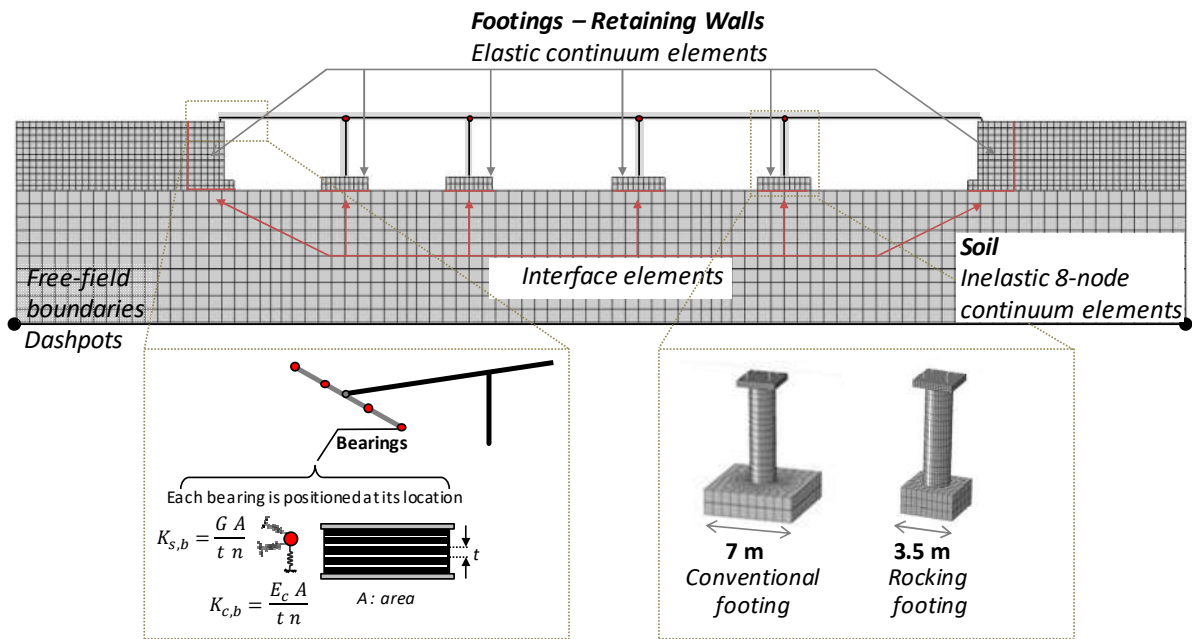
Details of the 3D FE model of the entire bridge-foundation-abutment-soil system.
